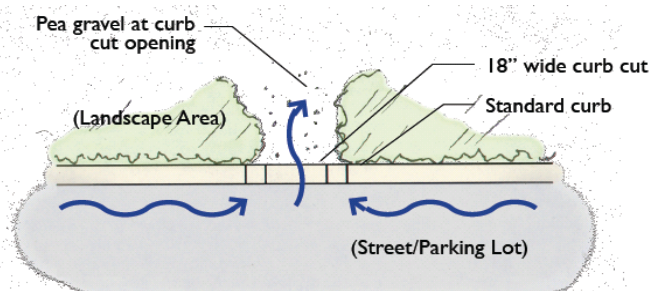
Standard curb cut: plan view (Source: SMCWPPP 2009)
